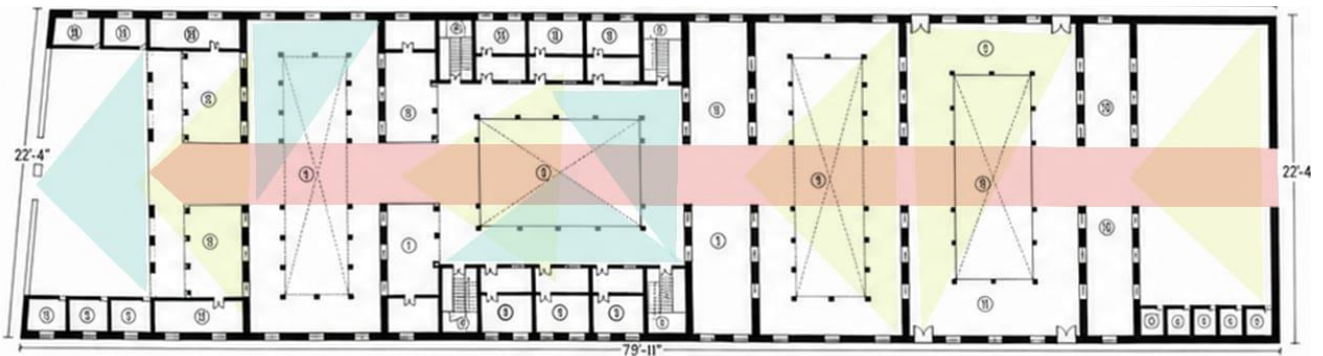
The Muthu Chettiyar Veedu – Ground Floor Plan Showing the Isovist View
